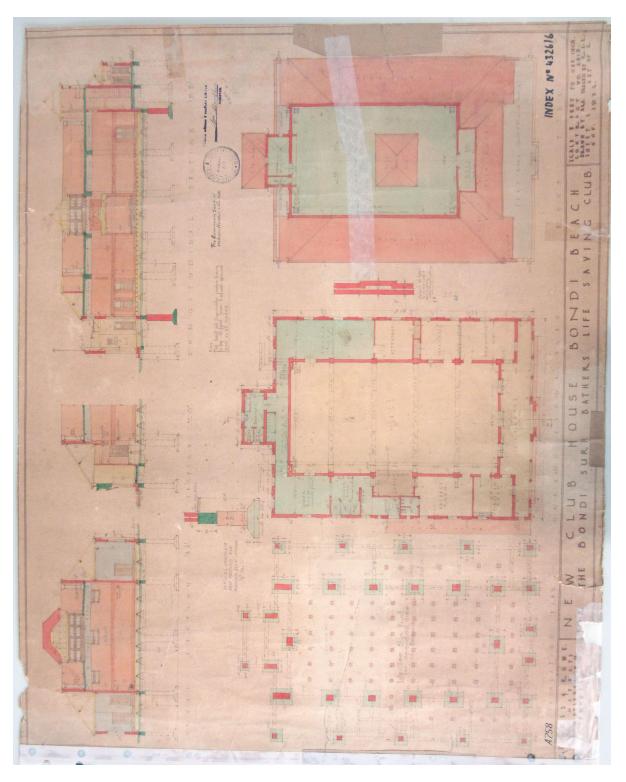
Drawing by Ross and Rowe showing the revised design of the surf club. The is a footing plan, ground floor plan and roof plan with the sun baking terrace. At the top of the drawing are sections showing the deep footings. The side rooms have pitched roofs and a roof lantern has been added to provide light to the hall. The lantern was built with a flat roof as an economy measure. Source: Jean Rice Architect, photographed at WC LSC.
